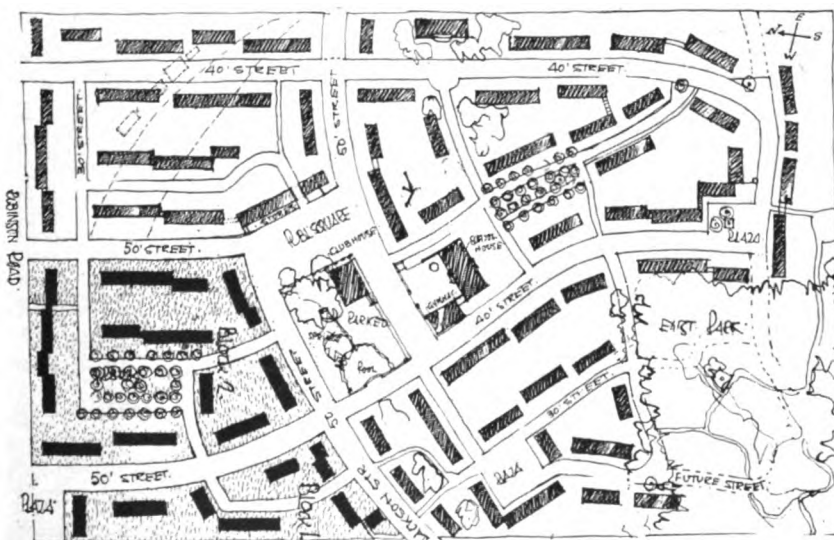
LAYOUT OF HOUSING SCHEME FOR YOUNGSTOWN SHEET & TUBE CO. SHADED PORTION SHOWS PART UNDER CONTRACT—FAINT DOTTED LINES ABOVE INDICATE LAYOUT OF CONSTRUCTION PLANT
